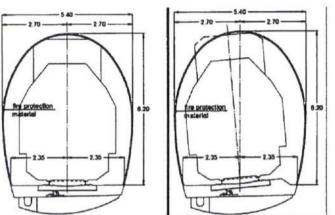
Indicative tunnel cross section - canted and uncanted sections
